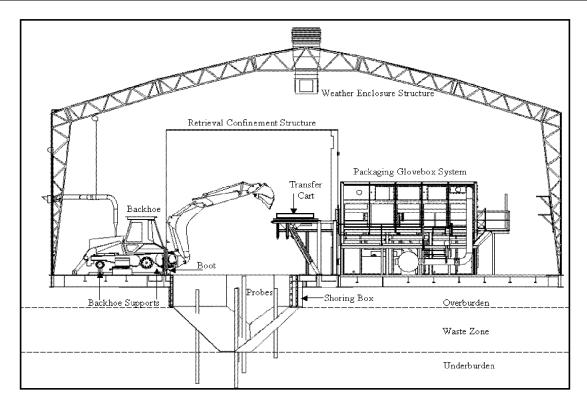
Cross section of the OU 7-10 Glovebox Excavator Method Project facility.
